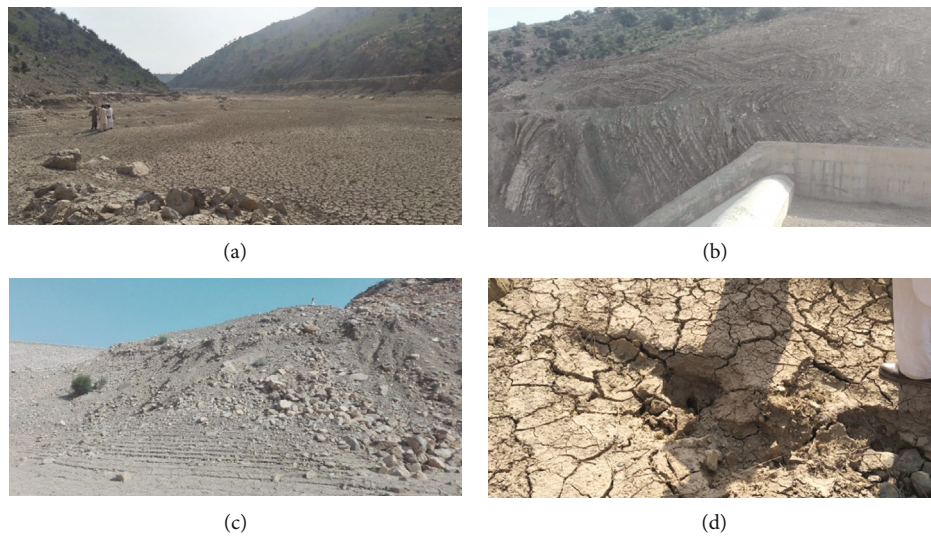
(a) Showing fluvial deposits, (b) showing crushed material towards right abutment, (c) alluvium towards the right abutment and water marks due to lowering of reservoir, and (d) mud cracks.
